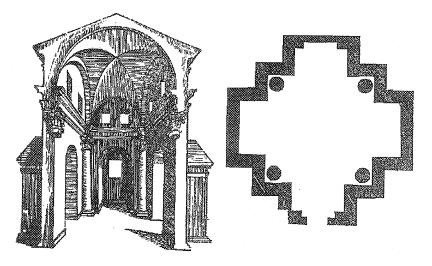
Serlio (1611). 3rd Book, 4th Chapter, Fol. 14. Section combined with perspective; Plan.
